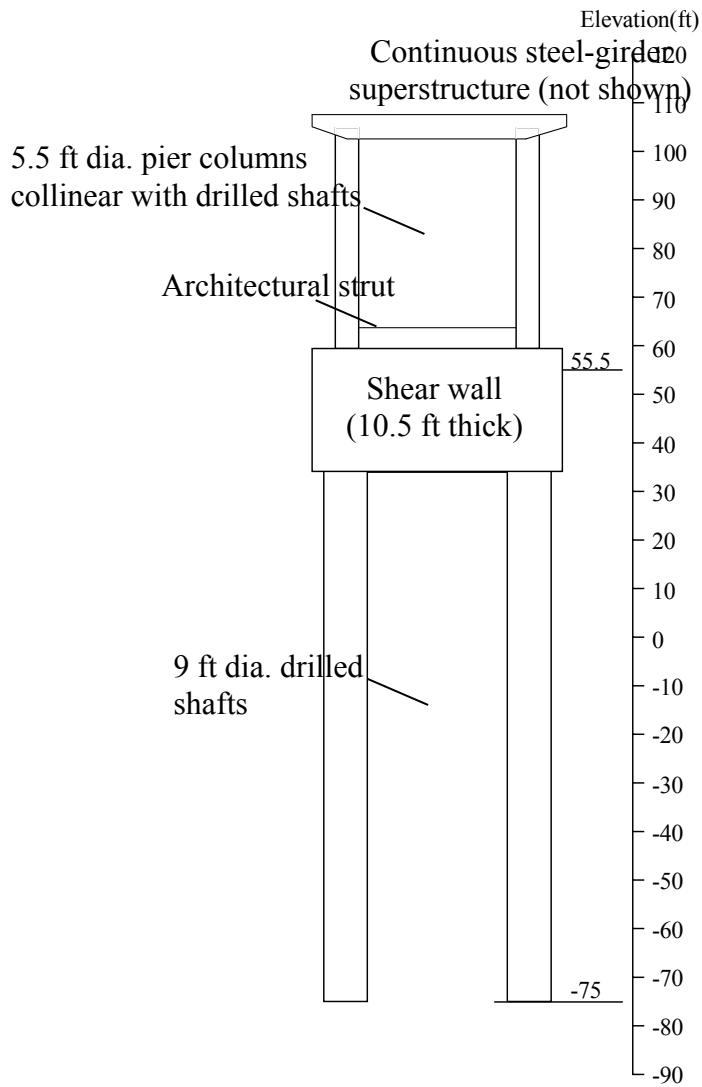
Pier 59 structural configuration (superstructure not shown)
